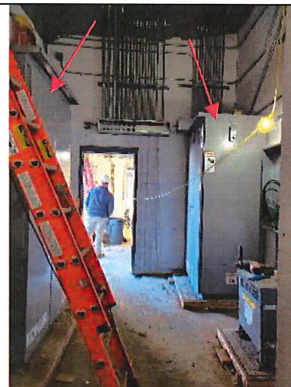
ATS-OS and ATS-E – Electrical Room 169.
